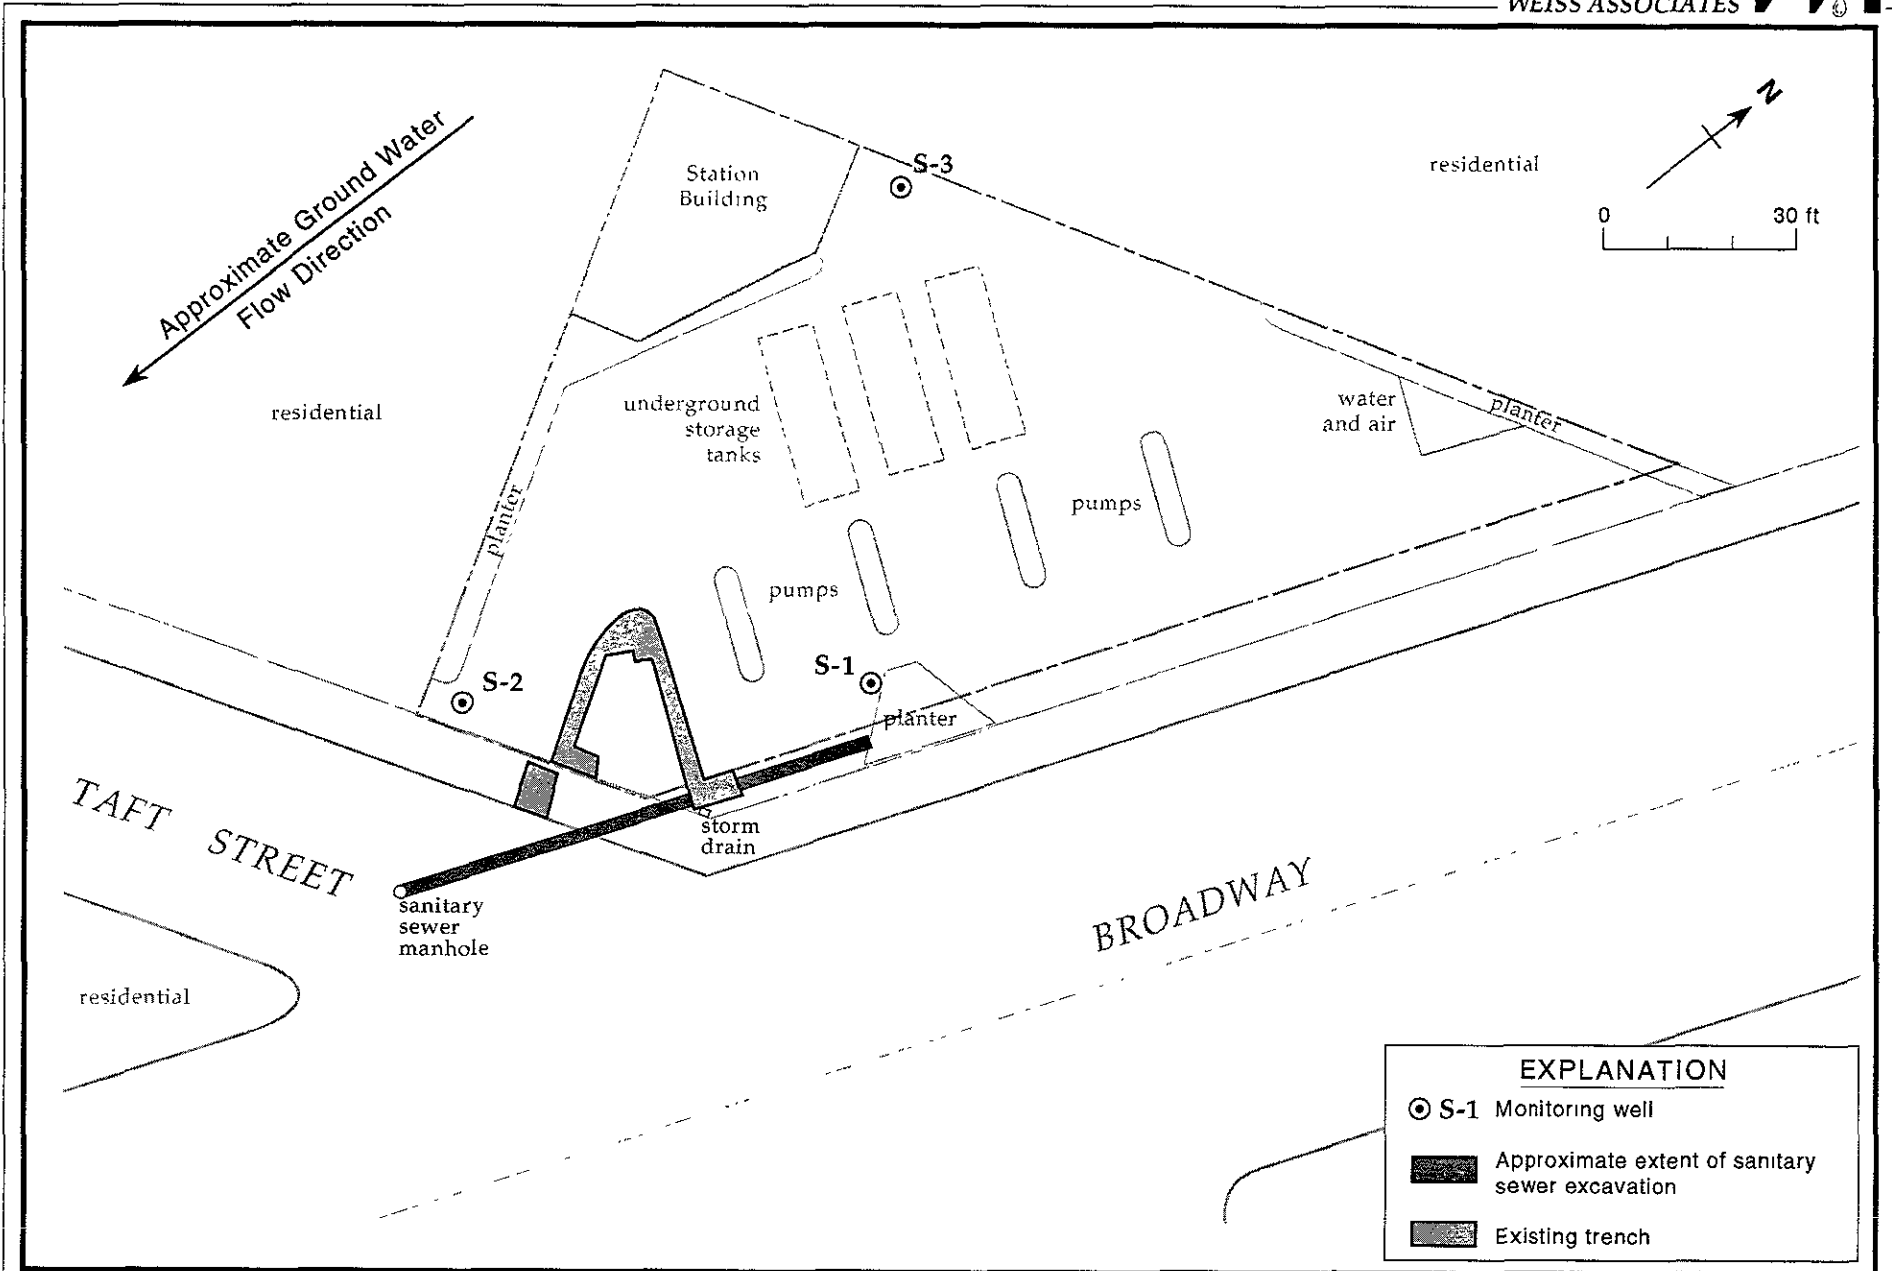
Sanitary Sewer Excavation and Existing Trench Locations - Shell Service Station WIC #204-2004-0204, 5755 Broadway, Oakland, California
